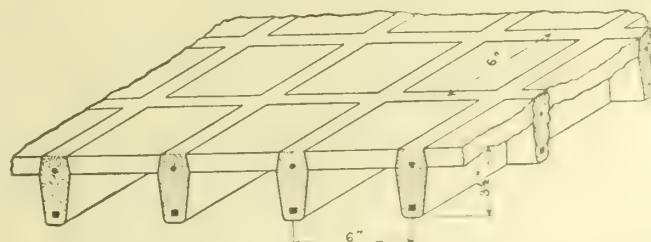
DETAIL OF "BRUNER" FLOOR LIGHT CONSTRUCTION
